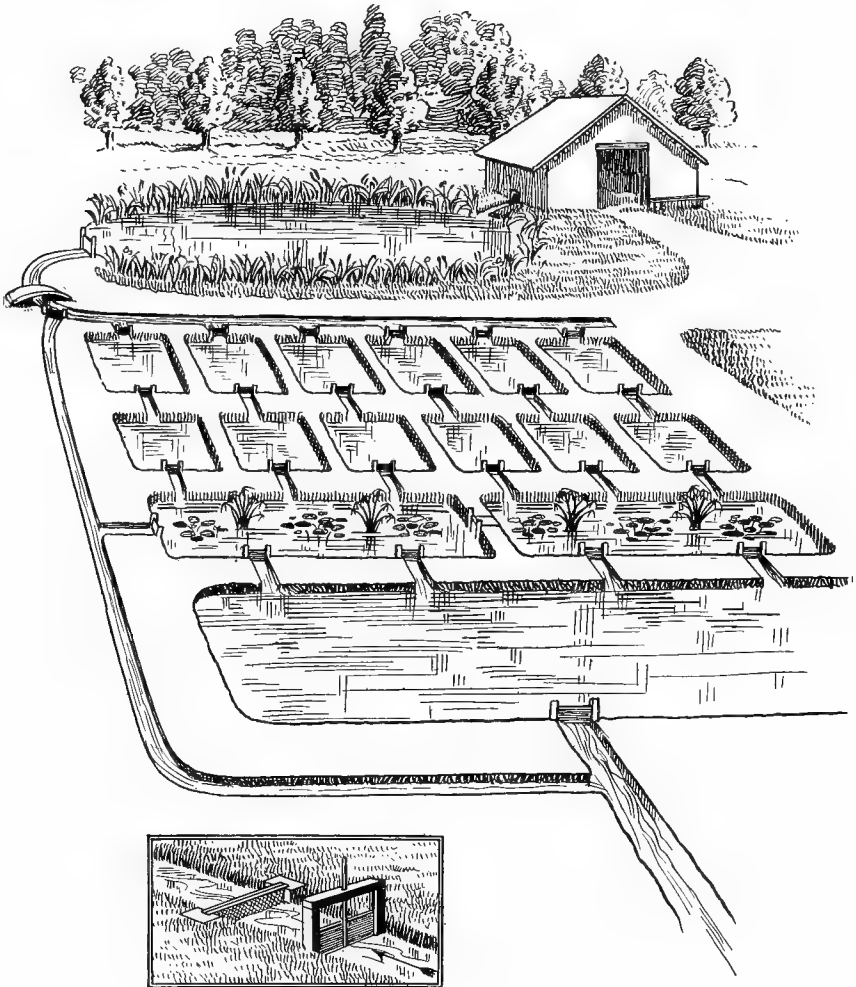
FARM BREEDING PONDS, SHOWING DETAIL OF SLUICE AND GUARD
